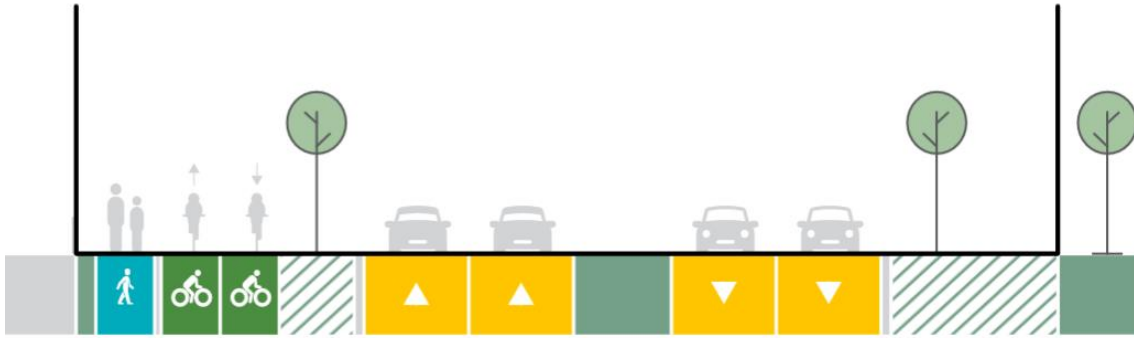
Indicative Access Road Upgrade cross section for rural section
